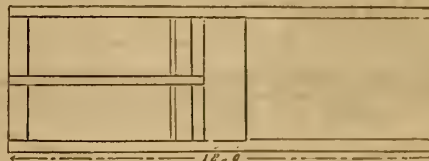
Plan. Scale 1/4 = 1 foot.
